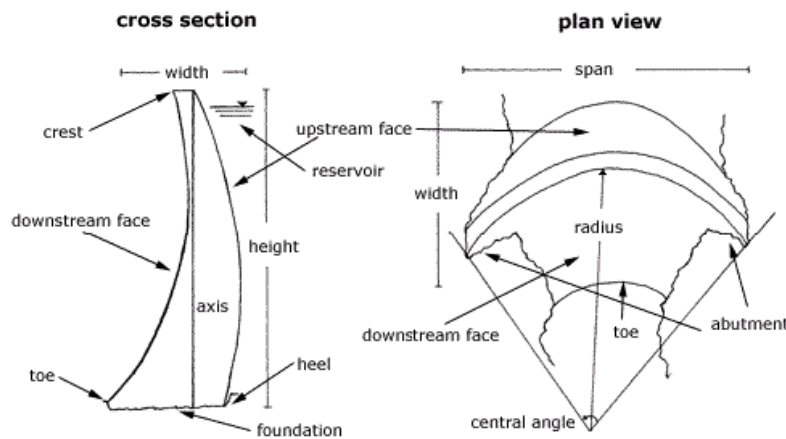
Typical Concrete Arch Dam Cross-Section and Plan View (Youssef, 2013)
